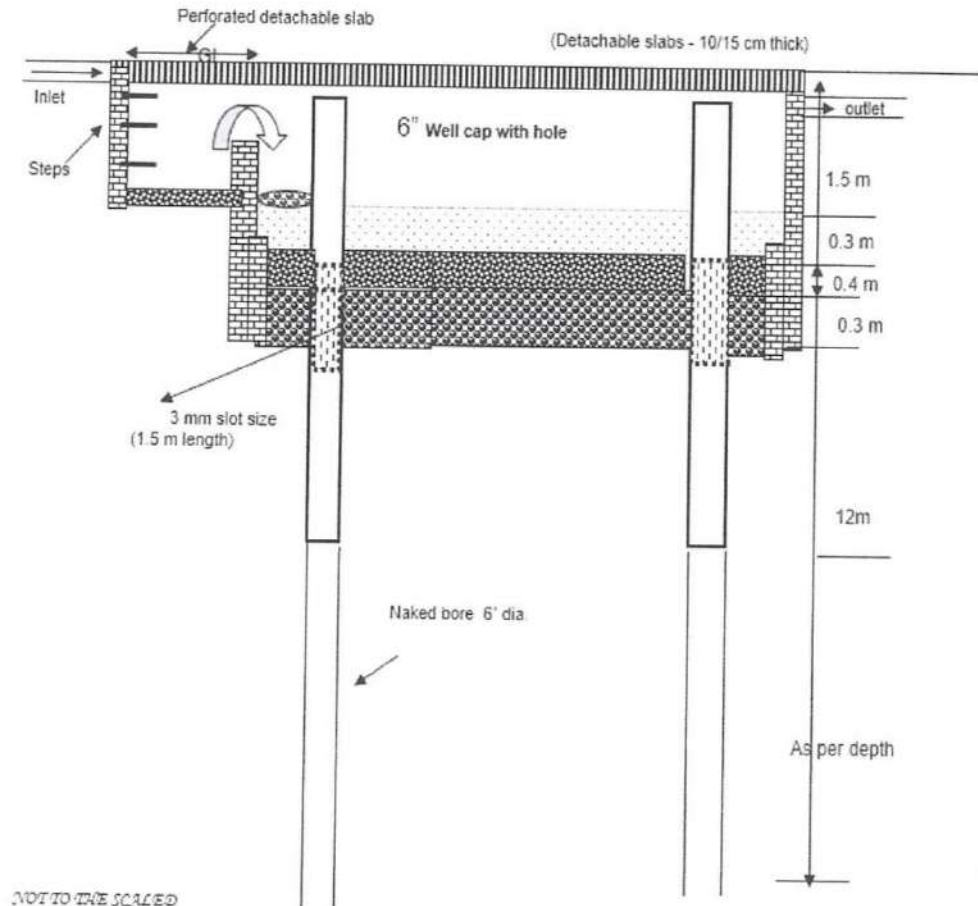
(a): Plan of proposed recharge structure (not to scale)
